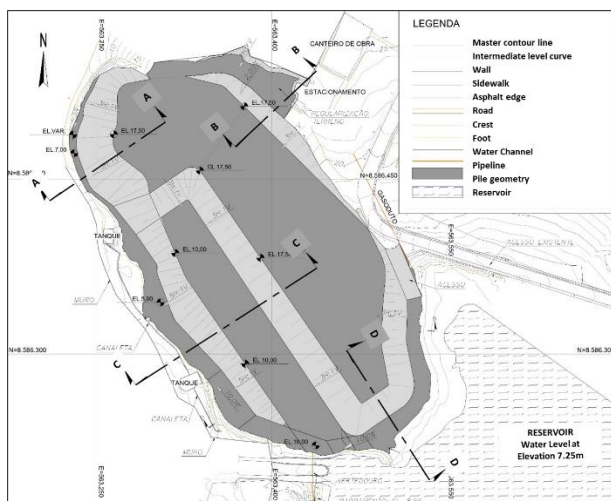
Location of the cross sections assessed for geotechnical stability for the Pile.
